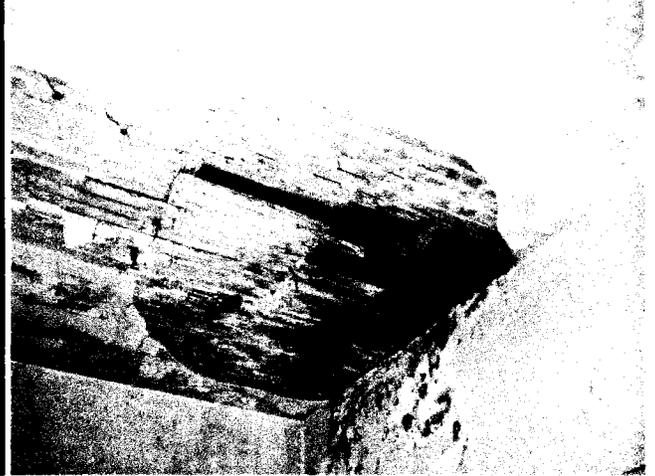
Wood Decay and Damage on Kitchen Ceiling
